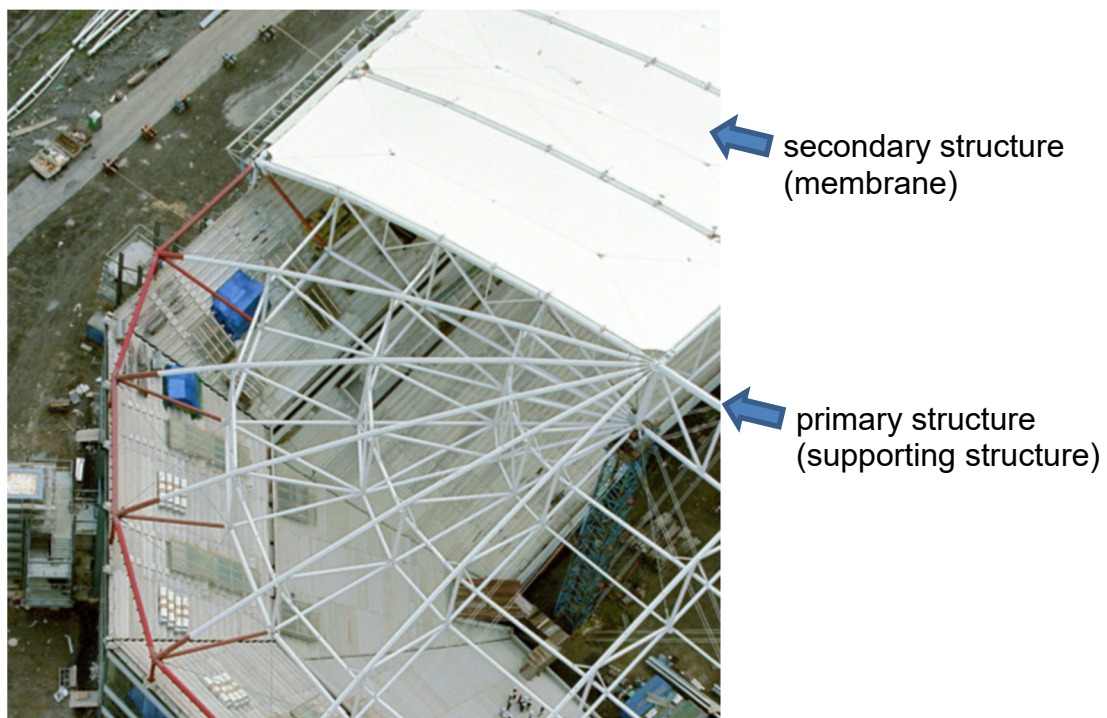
Example of primary and secondary structure for a membrane stadium roof (©FC Schalke 04)
